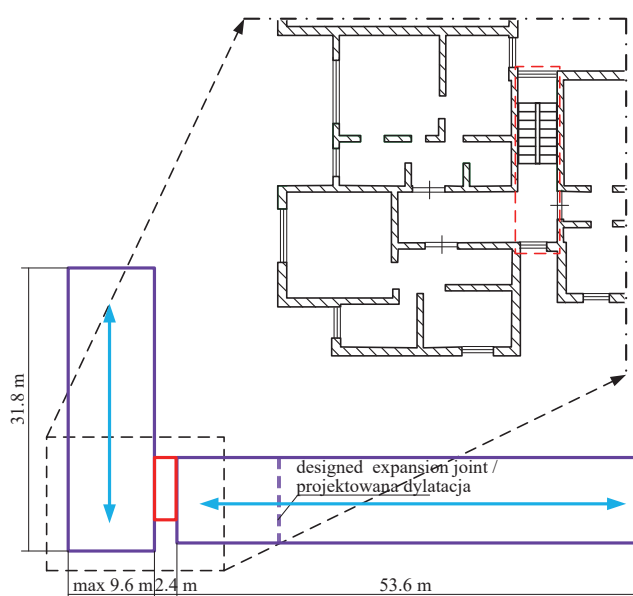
Plan of the building's structural layout with a detailed layout of the structure near staircase II
